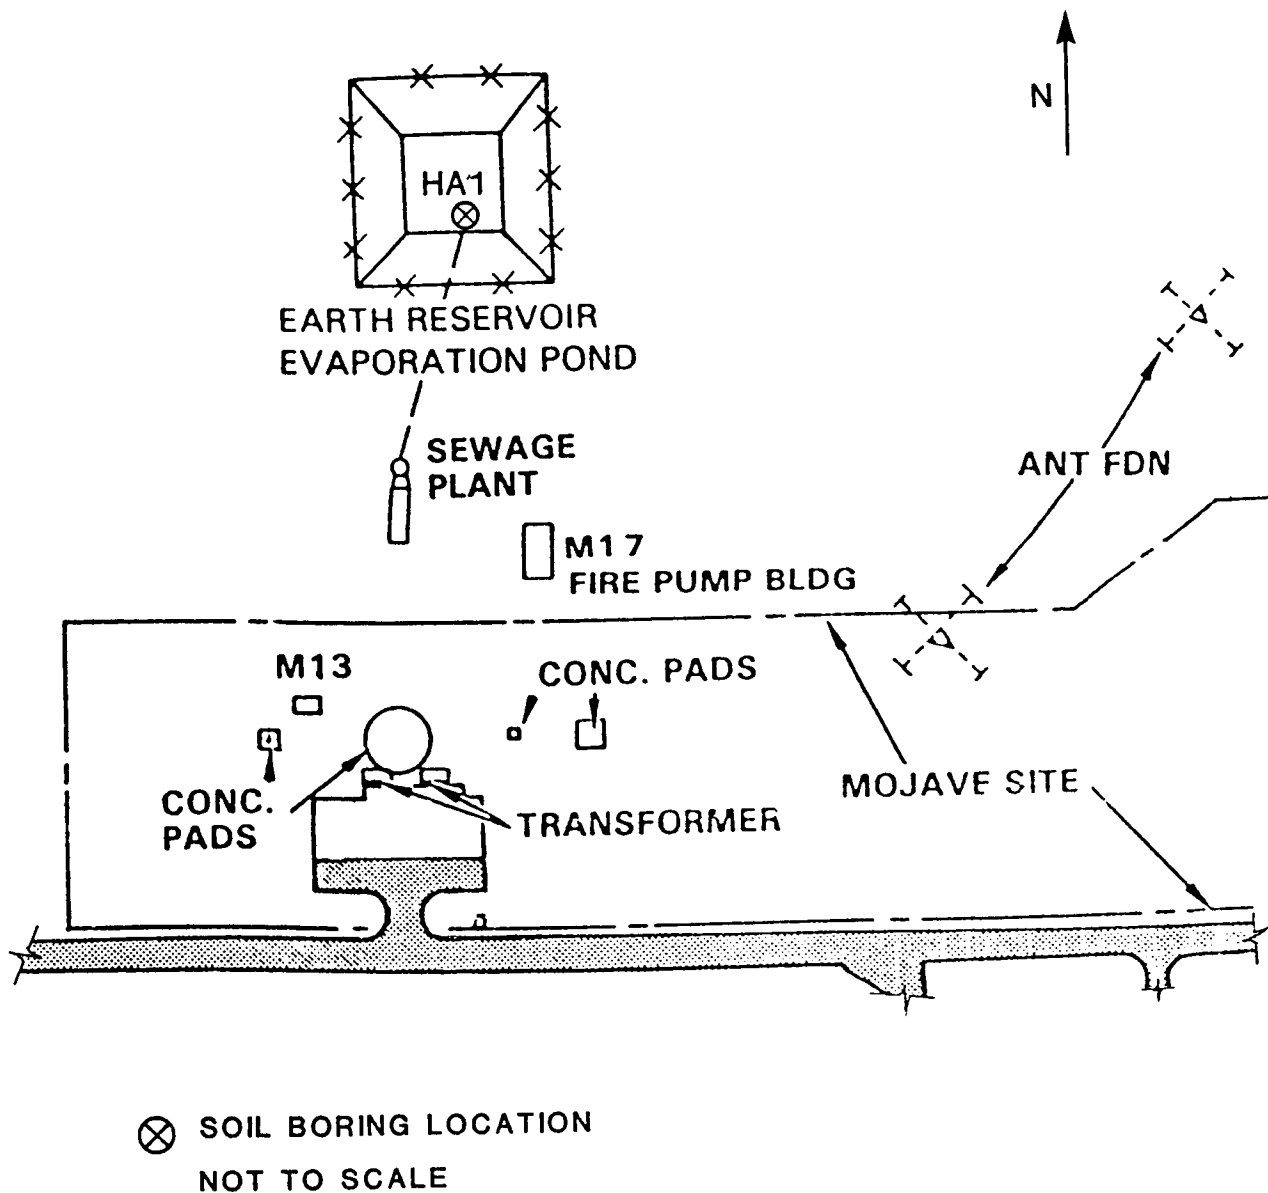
Mojave Base Site: Schematic Detail of Abandoned Sewage Evaporation Pond and Location of Single Borehole
